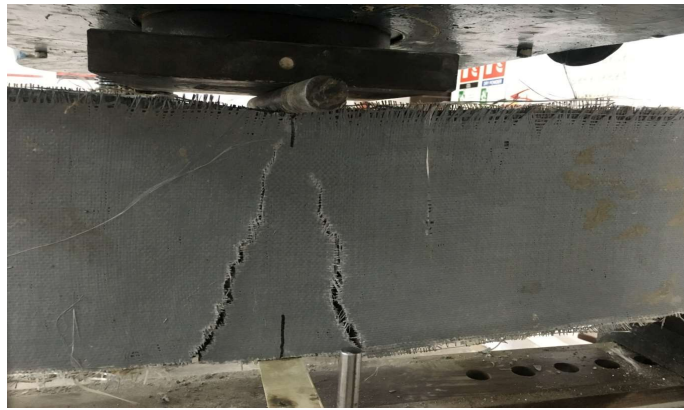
8 : Showing clear view of crack pattern of SW-B2 beam at failure
